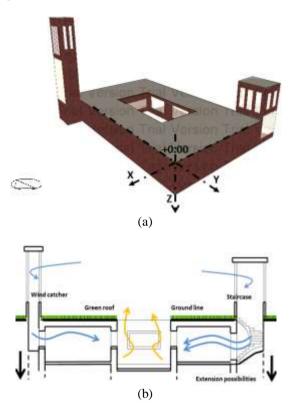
Underground building model for simulation tests: (a) 3D view, (b) Section
